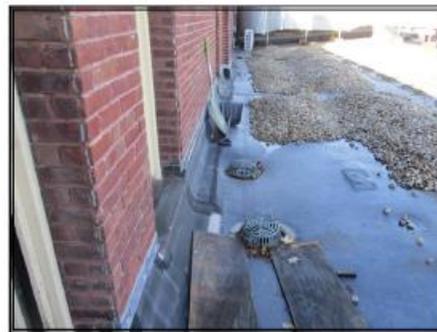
View of wall base, cupping insulation and bridging wall flashing at Shea Theater.
